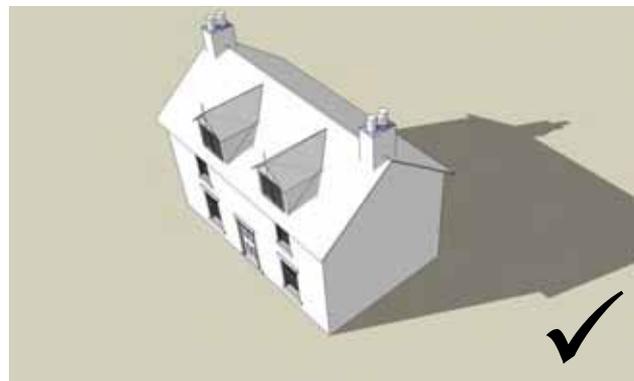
Where local precedent exists or where the design is deemed acceptable, front dormers may be possible.
